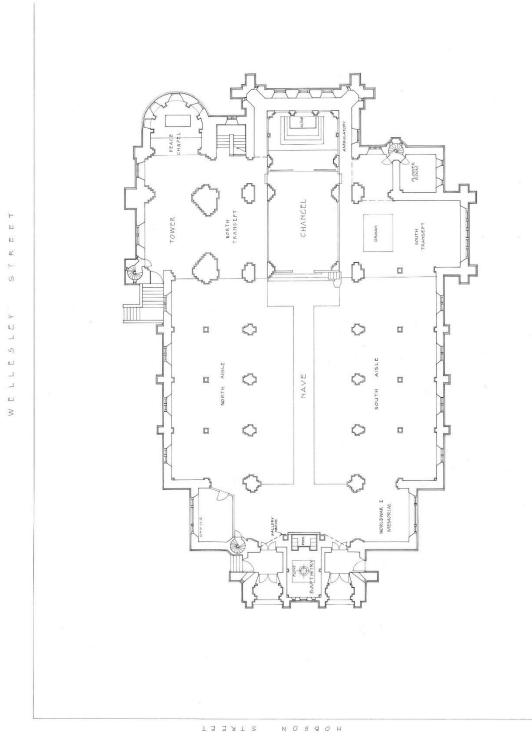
St Matthew-in-the-City – Ground Floor Plan
